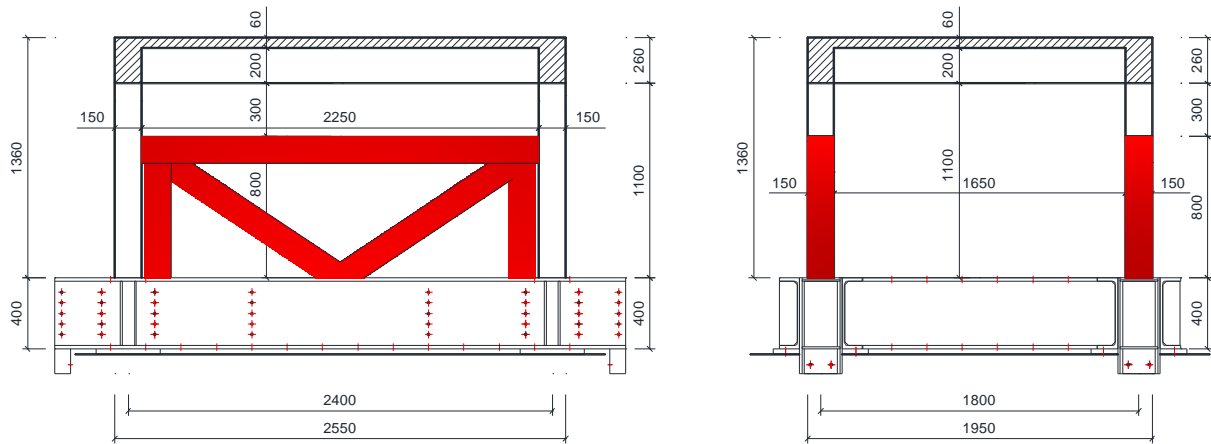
Geometry of the model (steel frame to simulate the infill wall is shown in red)
